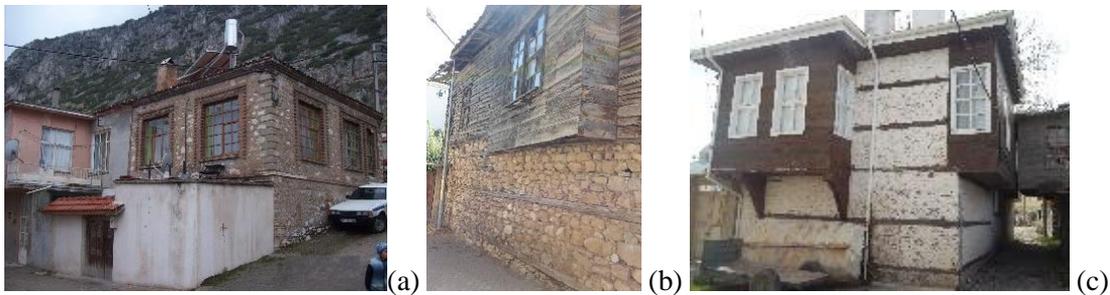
Construction system at traditional Eğirdir house (a) brick + stone masonry (b) stone masonry + timber framed (c) mixed use of systems.
